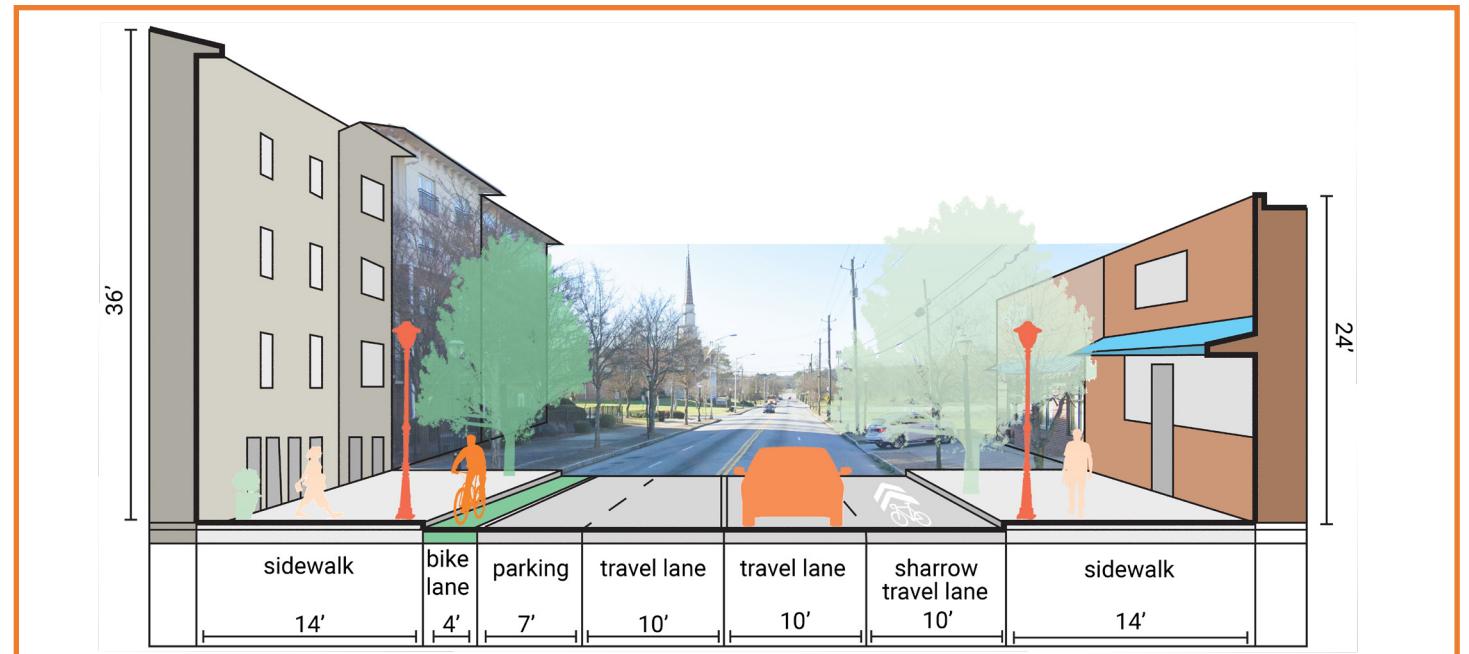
Cross-section of the Pryor Road corridor, looking south
